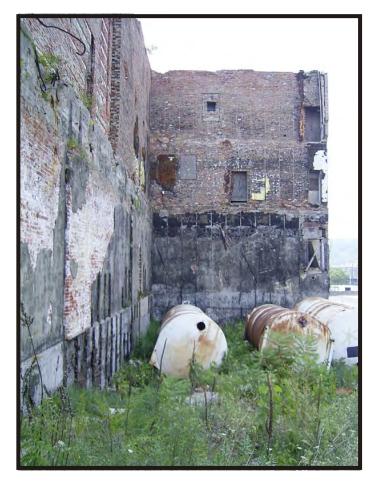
Detail of demolition site at the Hudepohl Brewing Company, facing south.
